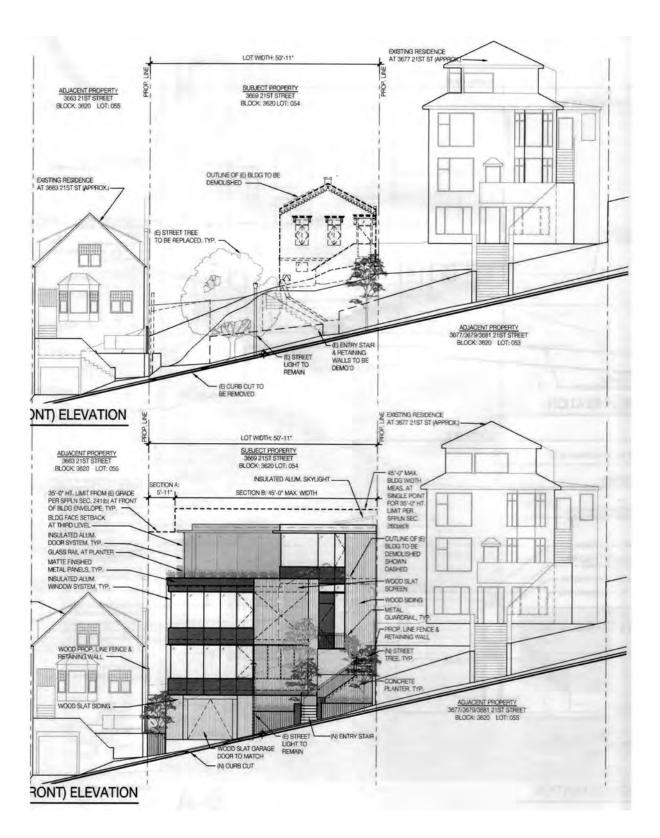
, detail of 3669 21st Street proposed site plan front elevation, sheet A-5, showing scale of project relative to my property, at left.
